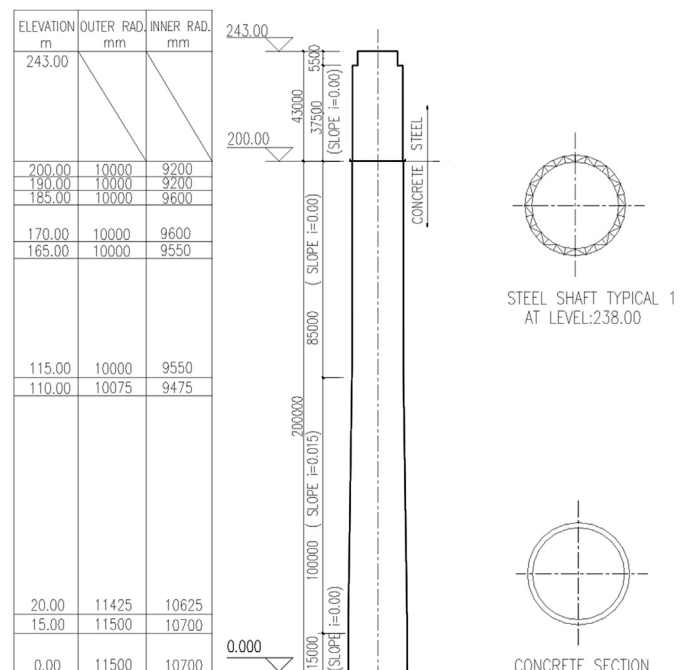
Elevation and cross section of the 243-meter-high solar tower.
